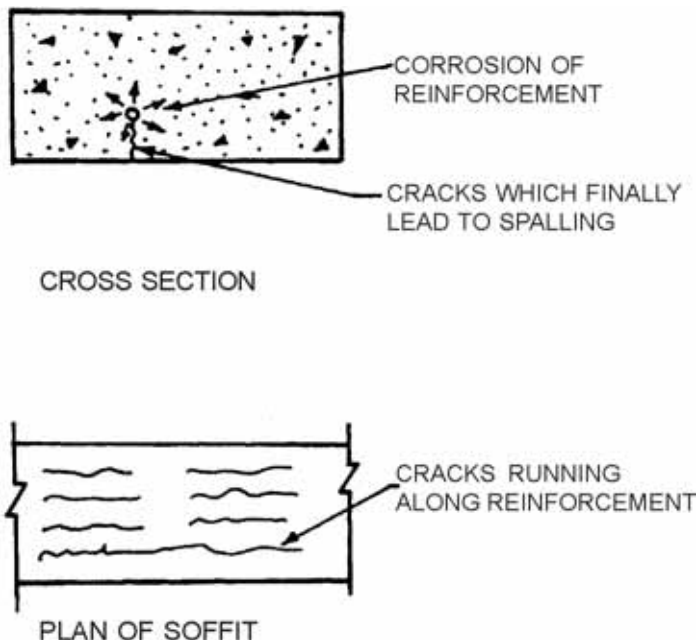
Cracks due to corrosion of steel reinforcement
